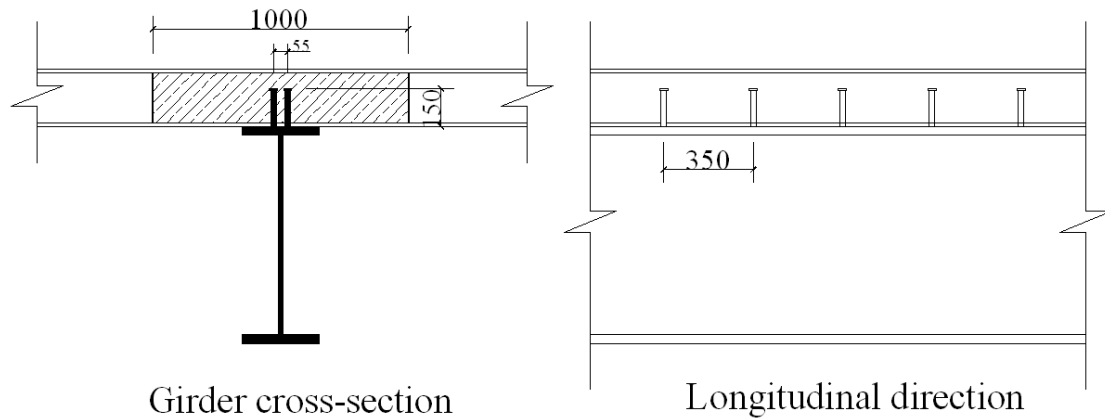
Configuration of shear stud connection between FRP deck and steel girders
